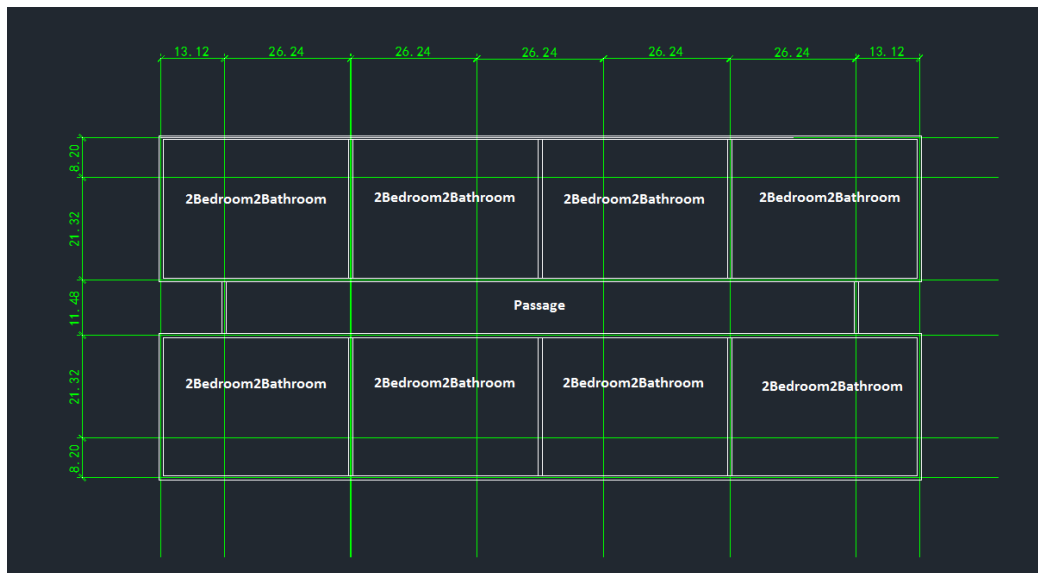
GENERIC FLOOR PLAN OF APARTMENT BUILDINGS. DIAGRAM DIMENSIONS ARE IN FEET.
